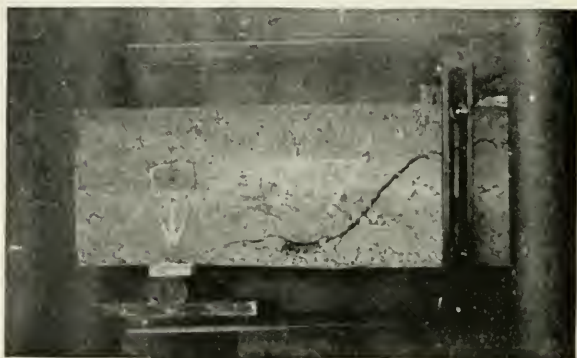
VIEWS SHOWING BEAMS AFTER FAILURE.
